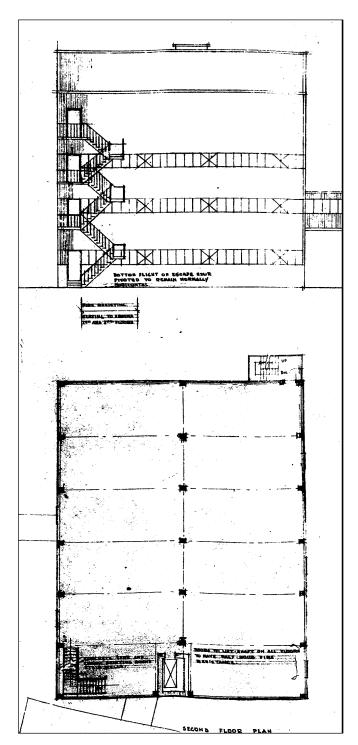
Building W1. Top: east elevation. Bottom: second floor plan. The rectangle at the bottom is for the lift. 45
